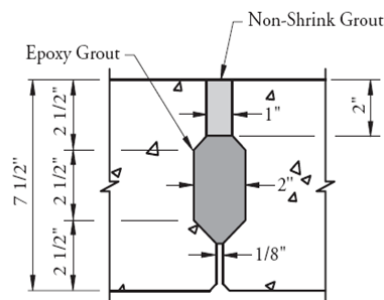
panel to panel connection performed with grout (PCI Bridge Manual)
